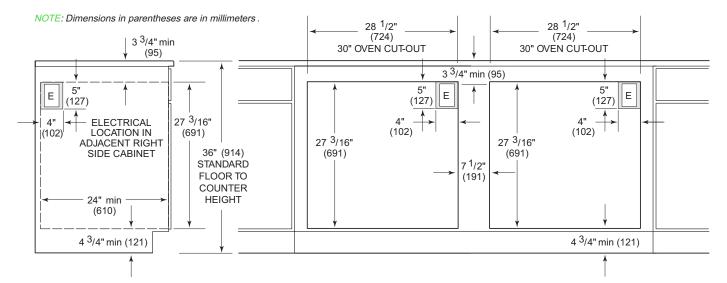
Undercounter Cutout Dimensions and Electrical Placement for SO30
